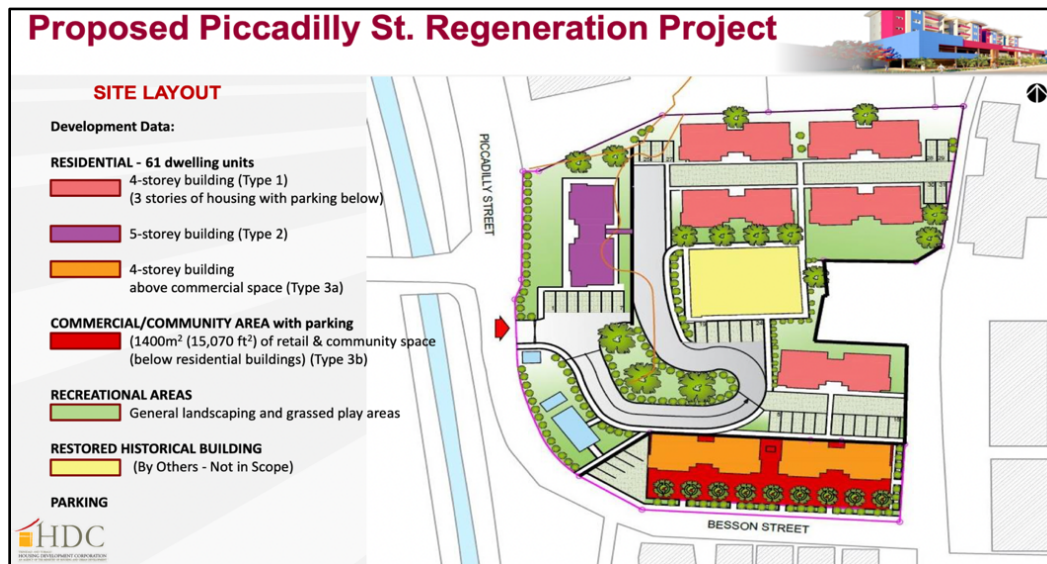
Piccadilly Street Project Proposal Site Layout (Source: Housing Development TT)
